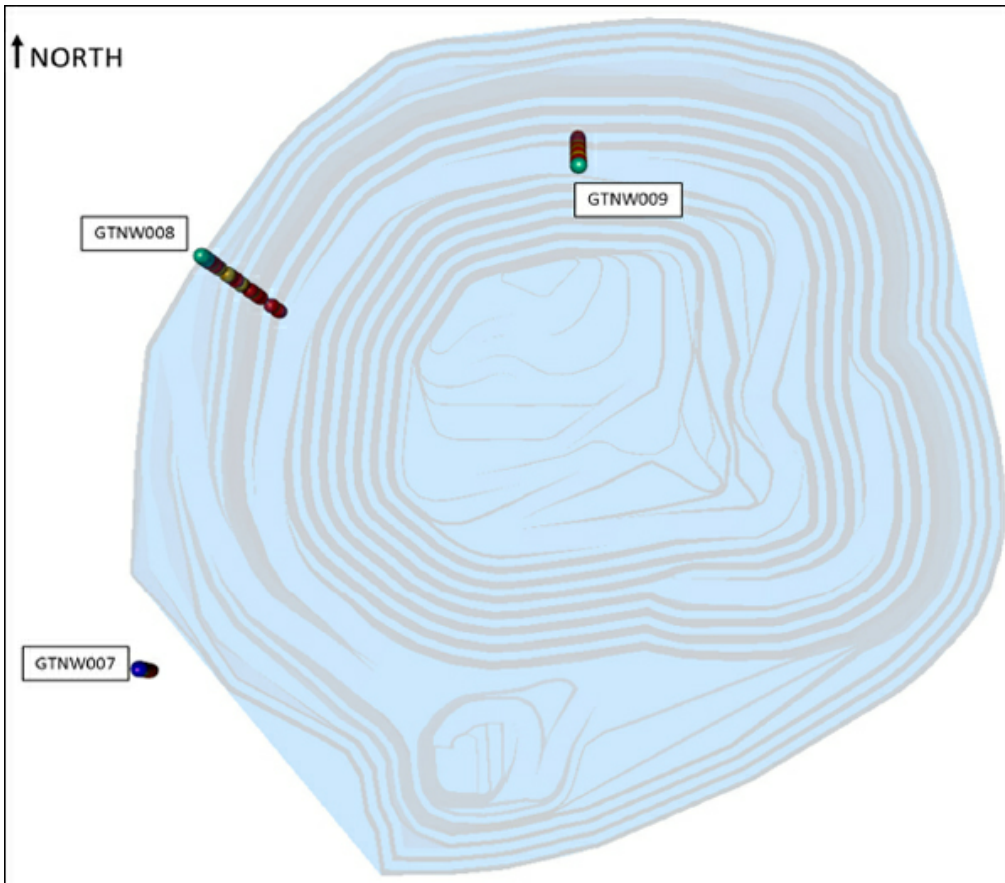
Plan view of preliminary Stage 4 pit design, with the location of laboratory test samples along each drill hole.
